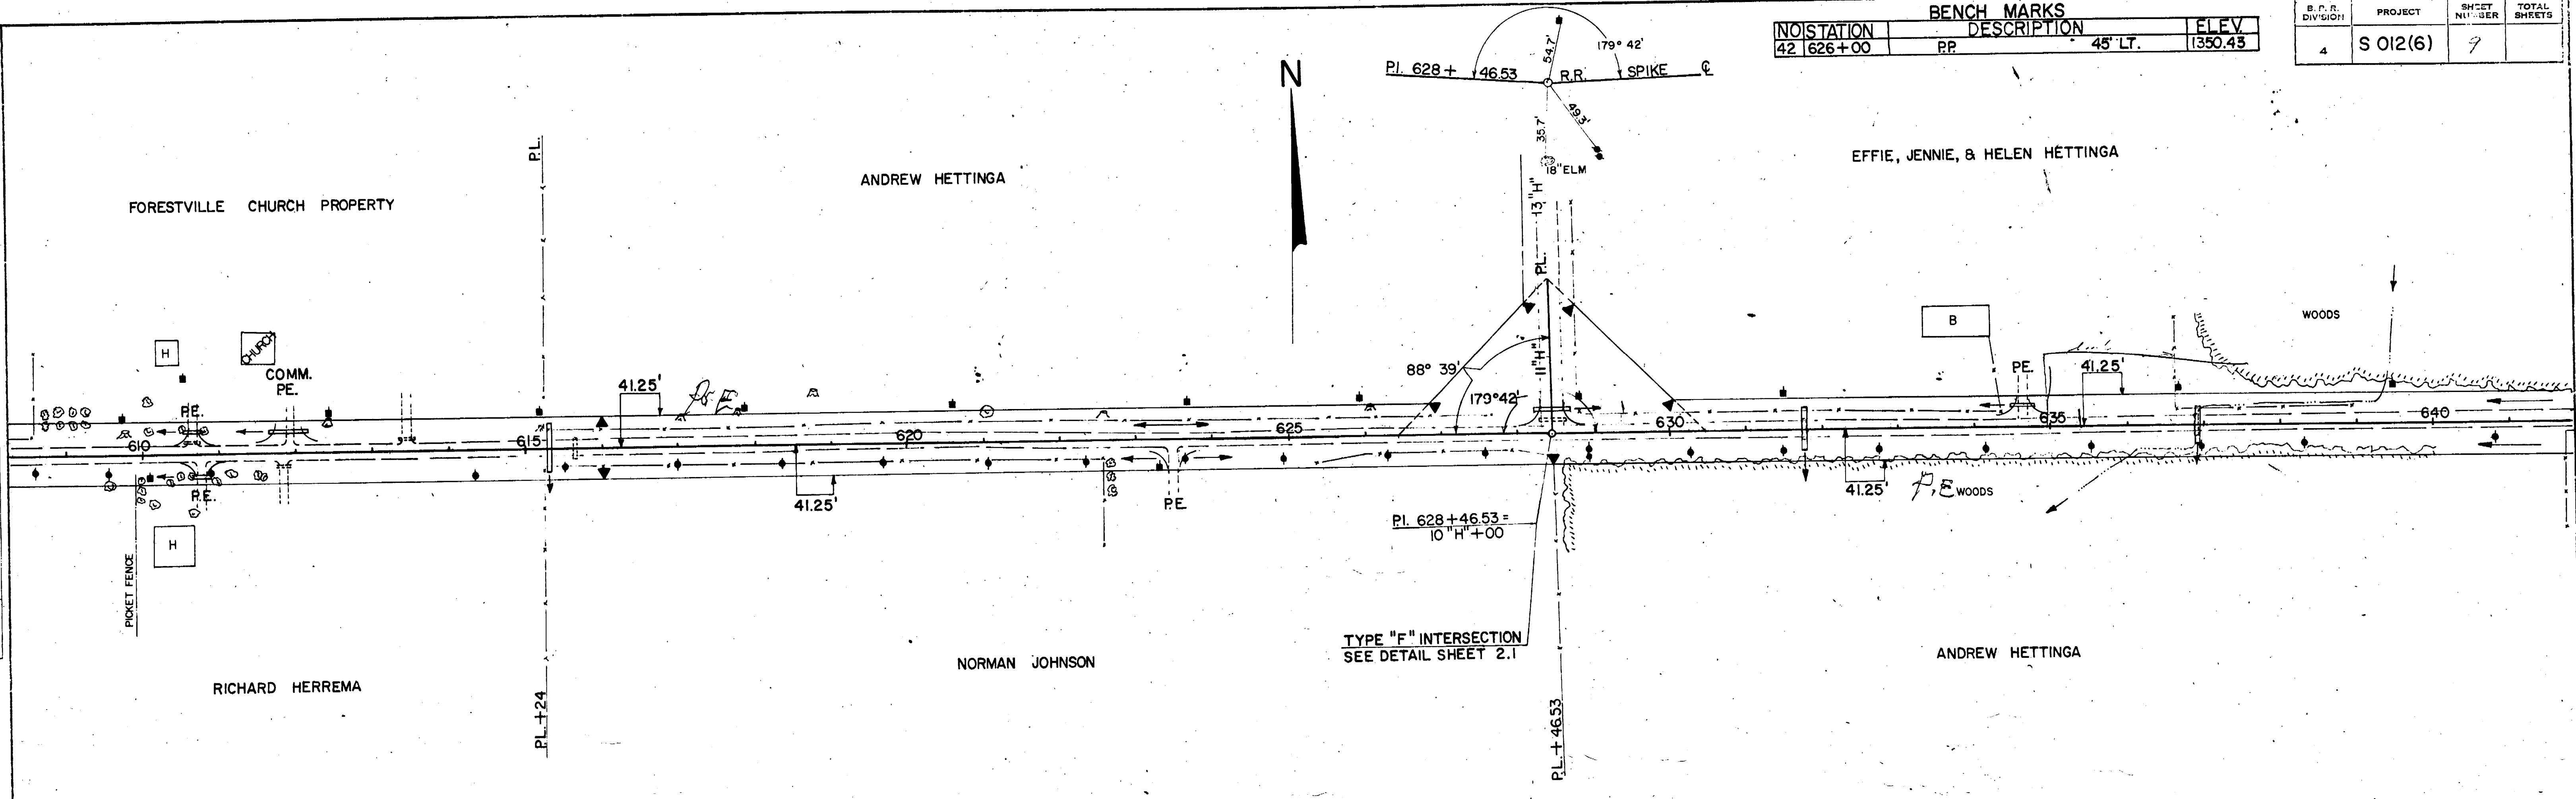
PLAN-PROFILE D.P.H. STANDARD
